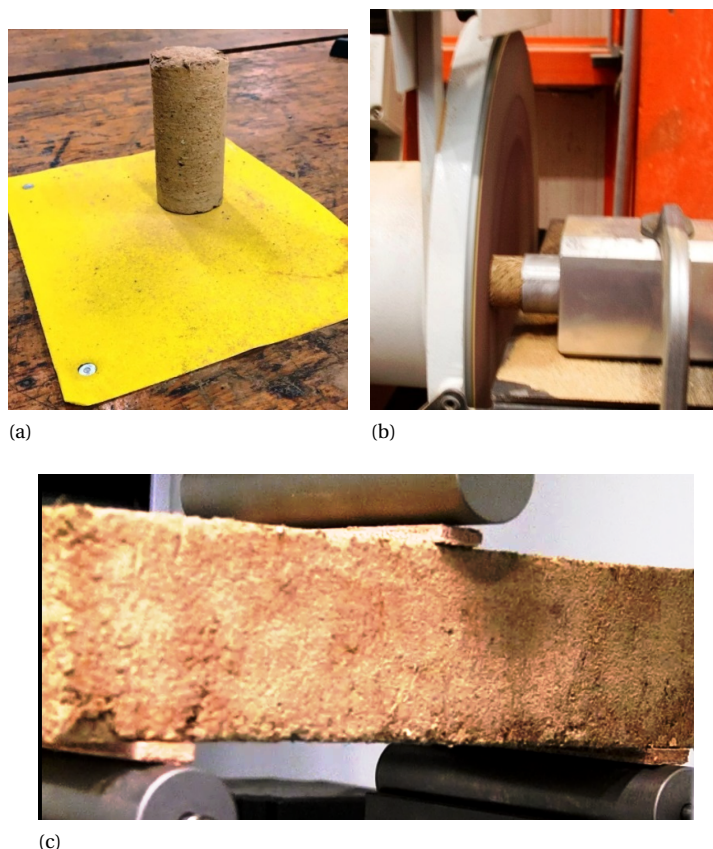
Sanding paper (a) and sanding machine (b) for rectification purposes and layer interposition in a three point bending test (c)
